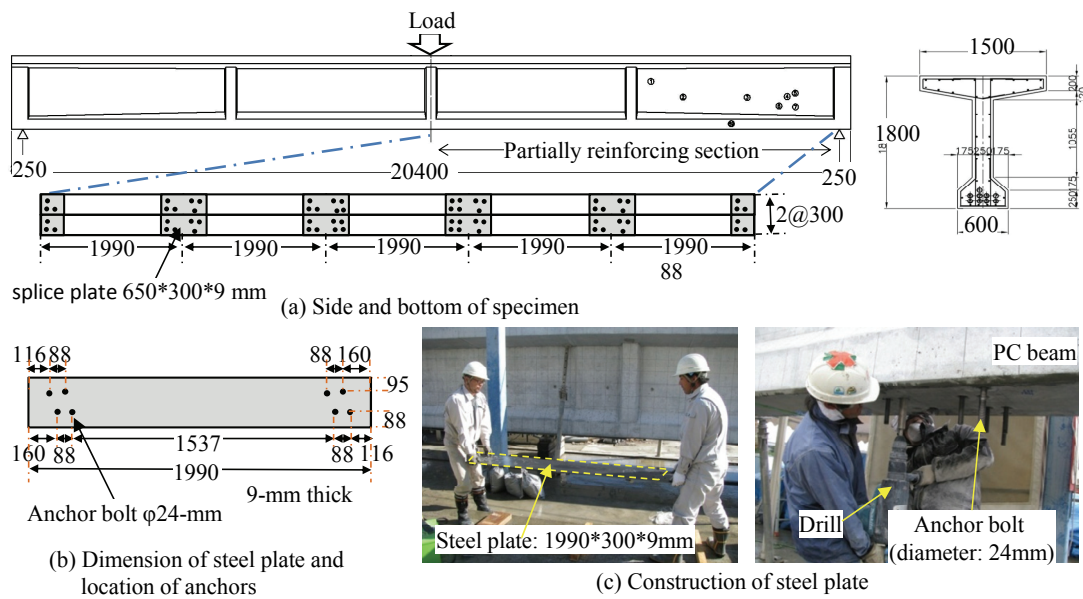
Location of steel plate and anchor bolt for strengthening PC beam (unit: mm)
